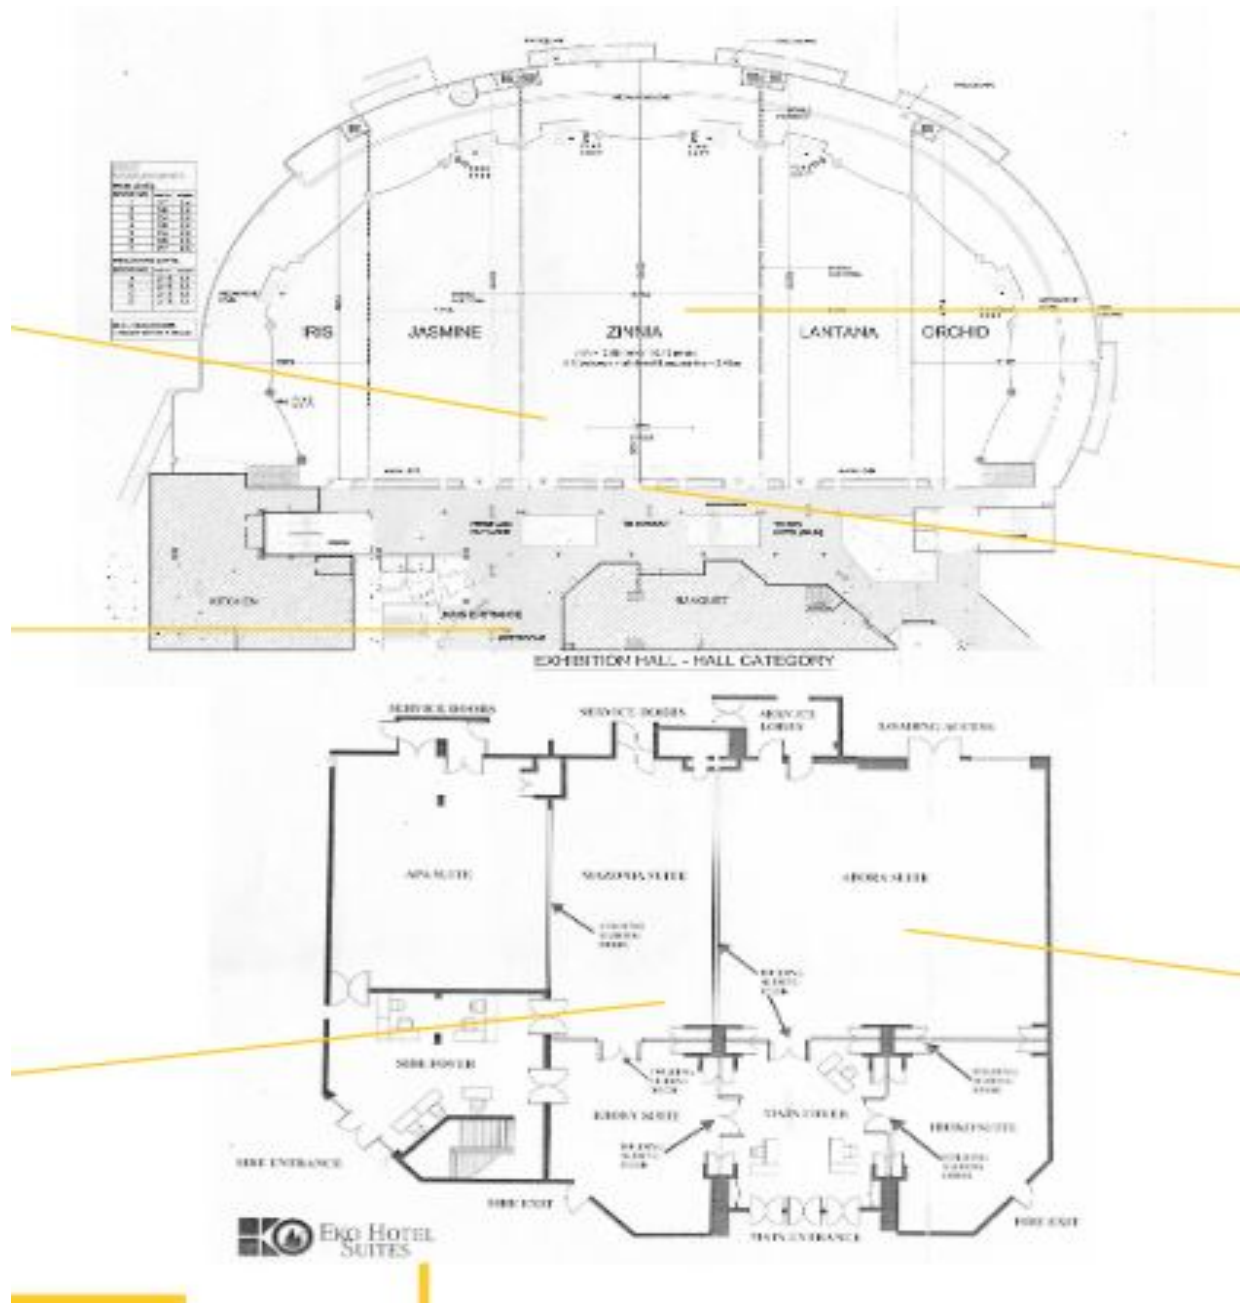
Floor plan of Eko Convention Centre (Source: Ekohotels.com)
